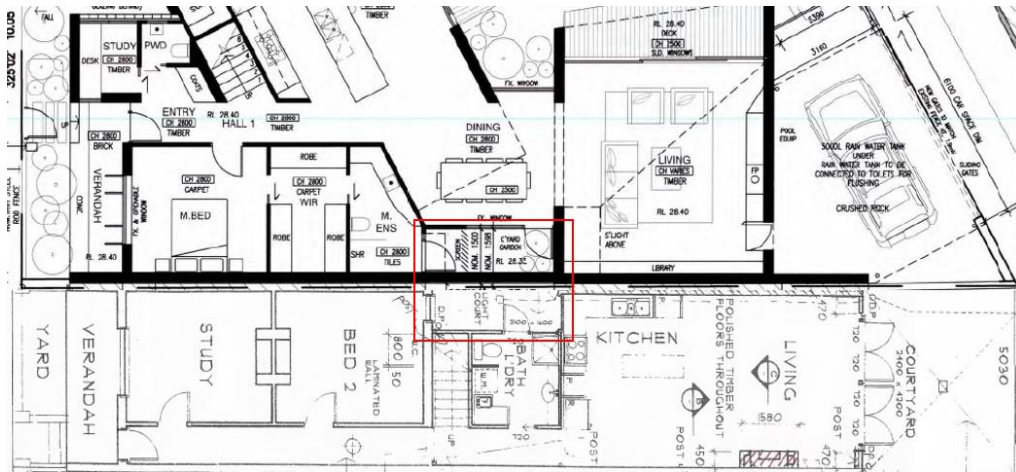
Ground floor plan of No. 24 Grant Street and proposed ground floor plan of subject site – light court boxed in red (Planning Permit No. PLN12/1037 & Applicant Submission)
